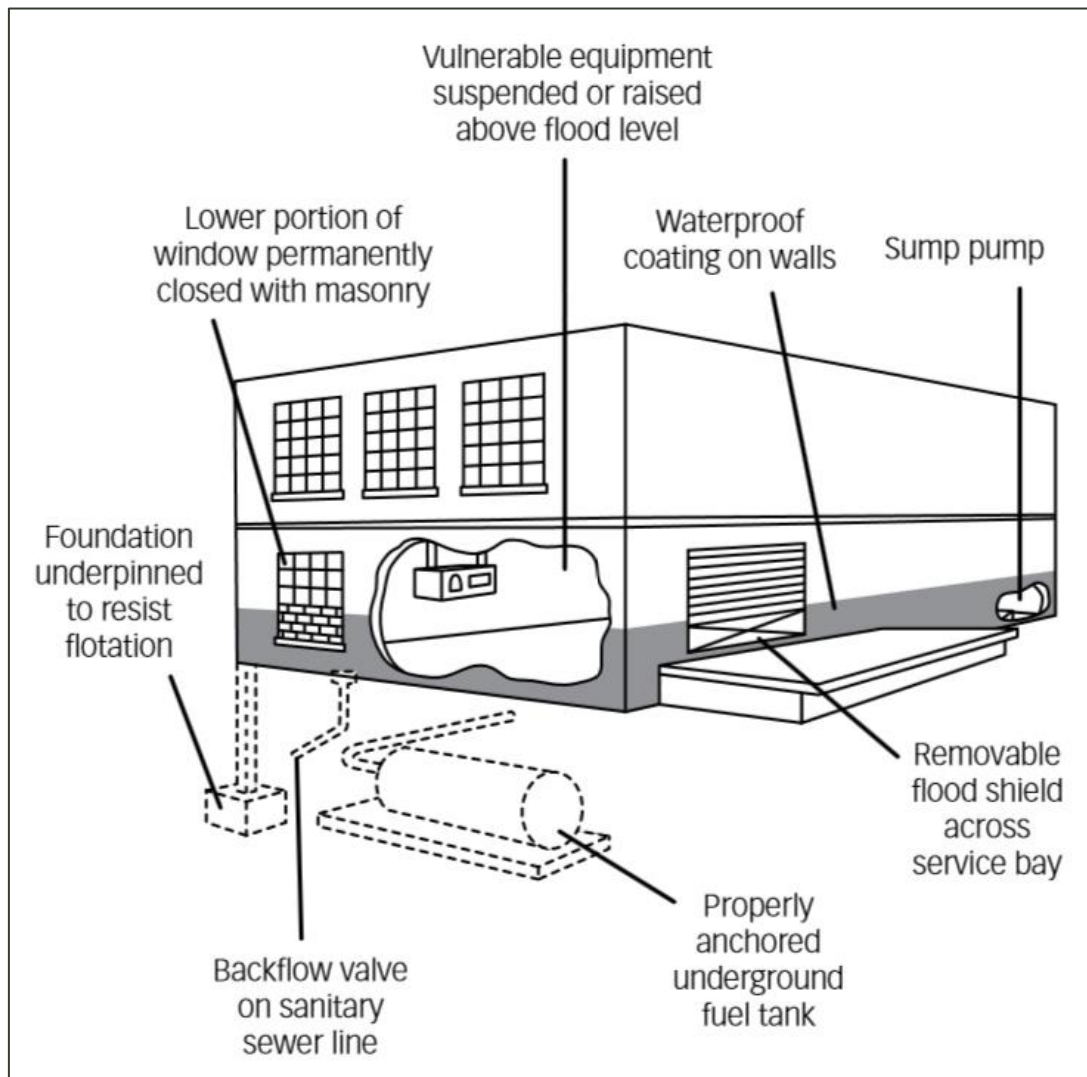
Dry flood proofing measures (Lloyd's, 2008)
